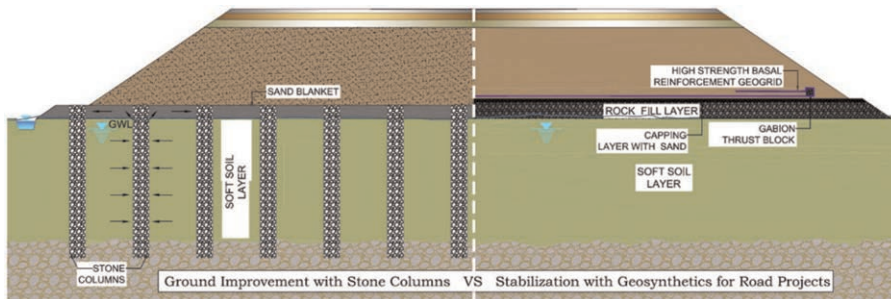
Stone columns option in first design Vs finally adopted basal reinforcement technique.
